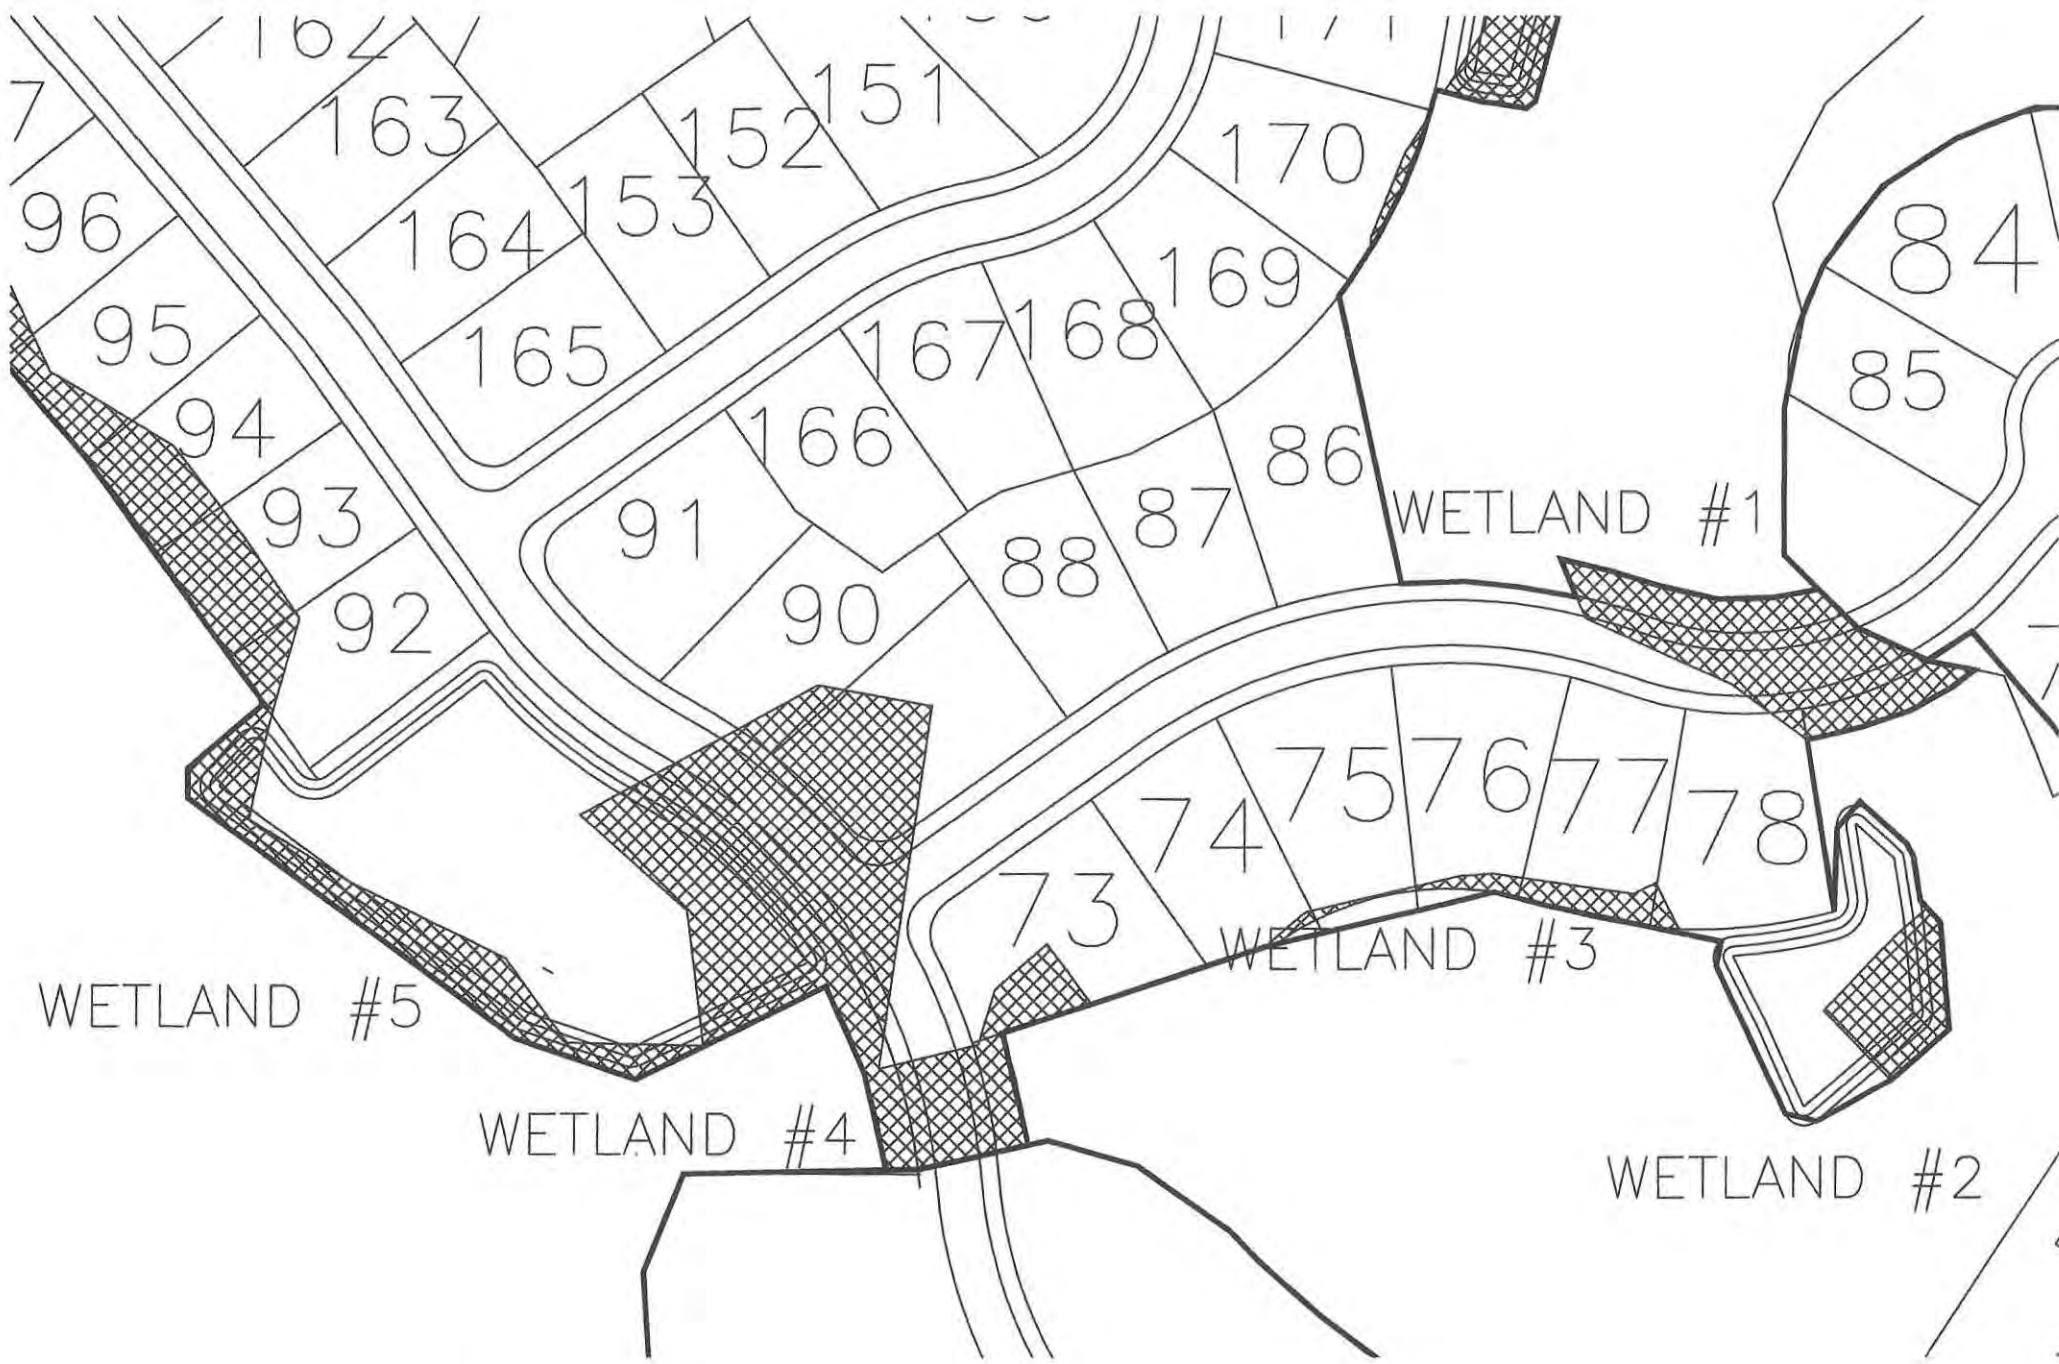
CARR BRIDGE SUBDIVISION PHASE 4 PROJECT LAYOUT
